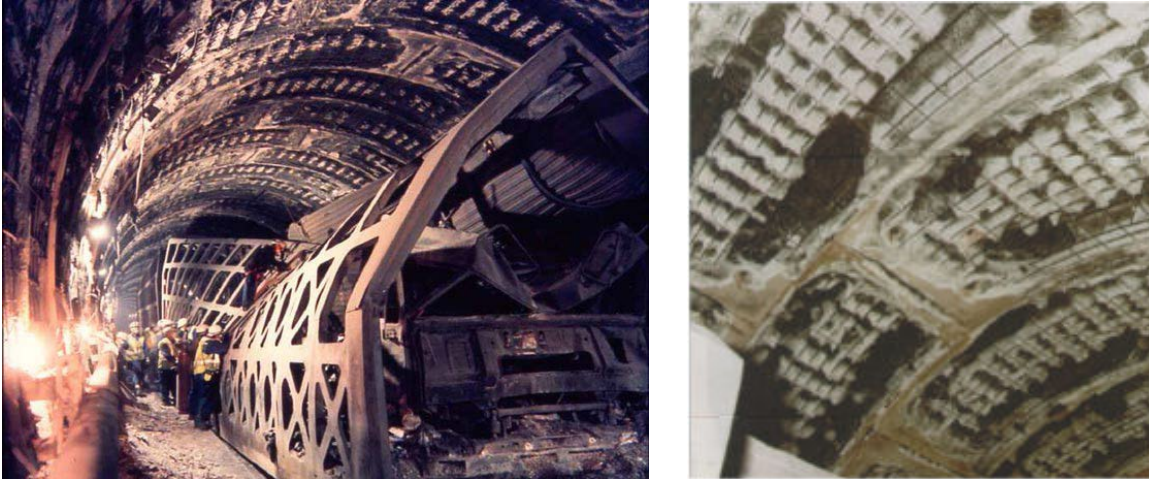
Damaged concrete in the Channel Tunnel due to fire (Høj et al., 2008)
